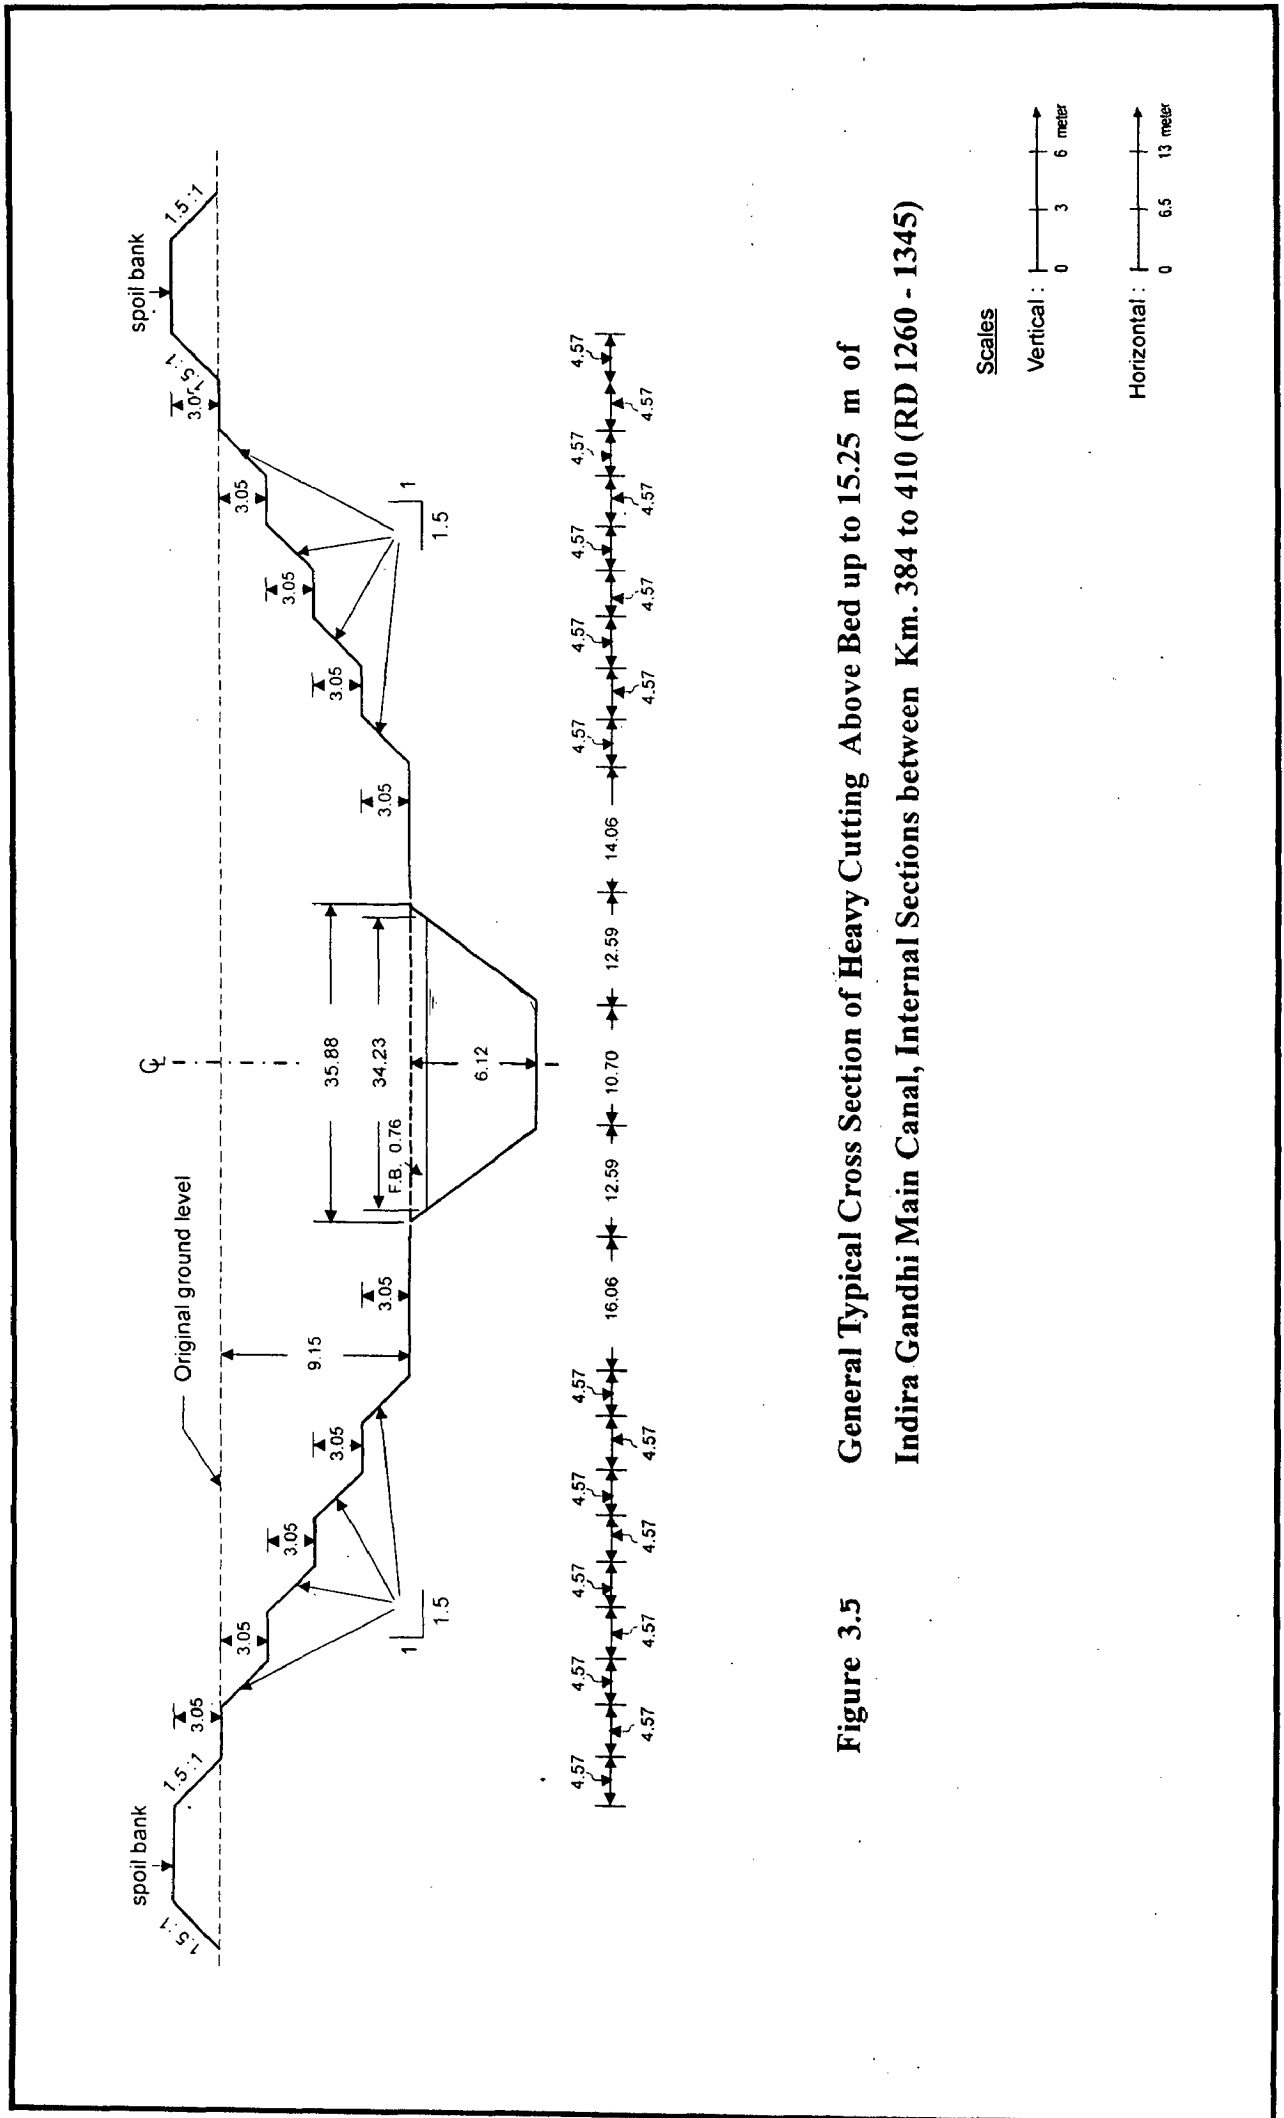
General Typical Cross Section of Heavy Cutting Above Bed up to 15.25 m of Indira Gandhi Main Canal, Internal Sections between Km. 384 to 410 (RD 1260 - 1345)
